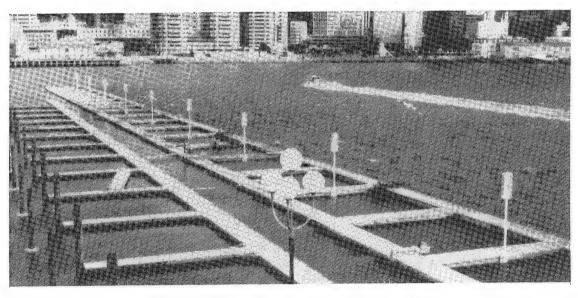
Completed precast concrete floating breakwater at Chaffers, New Zealand, (from New Zealand Concrete Construction (1993-1994))
